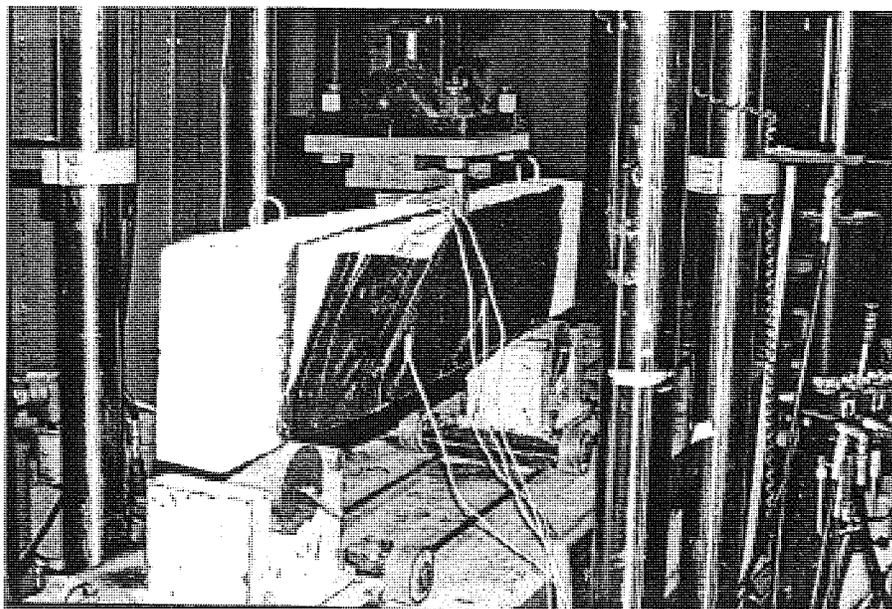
Shear-failure after delamination of CFRP sheet in Beam No. 2
